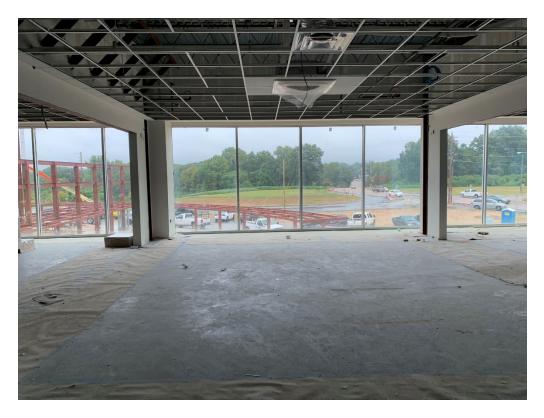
Versatile Teaching Space 210 Grid Ready for Ceiling Tile
